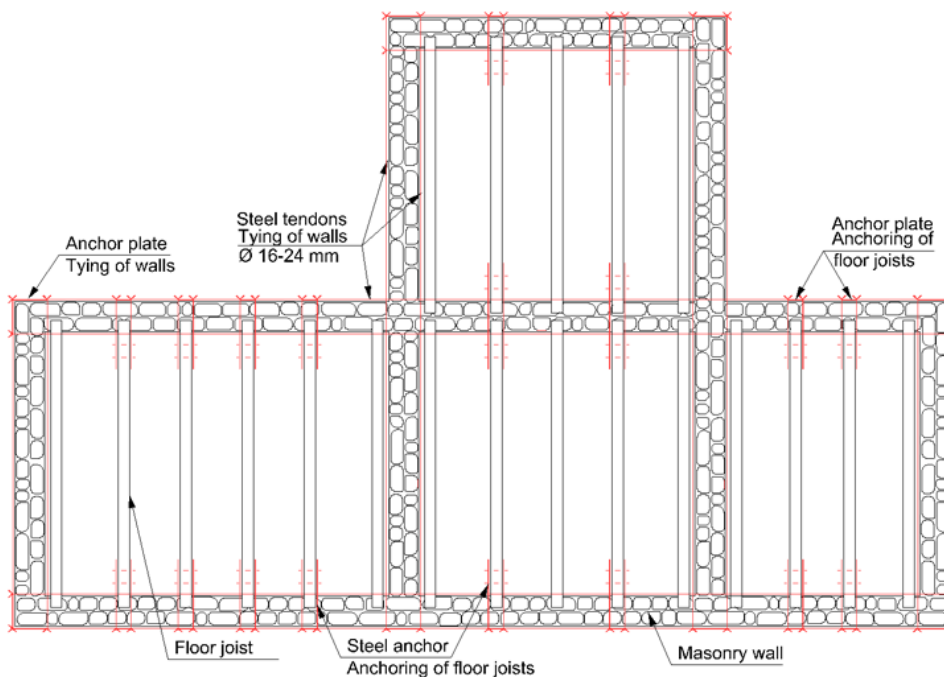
Position and distribution of wall and floor joists steel ties in plan of a stone masonry house
